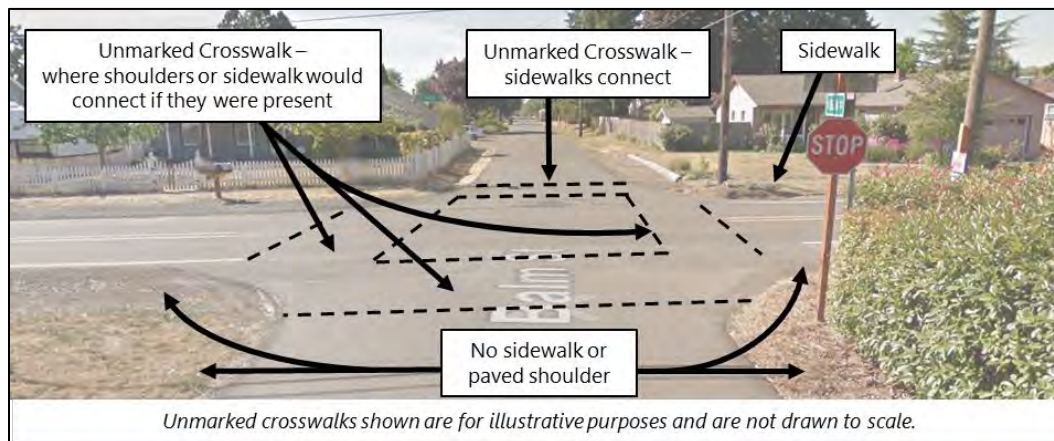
Unmarked Crosswalk Locations where Sidewalks/Shoulders Connect
